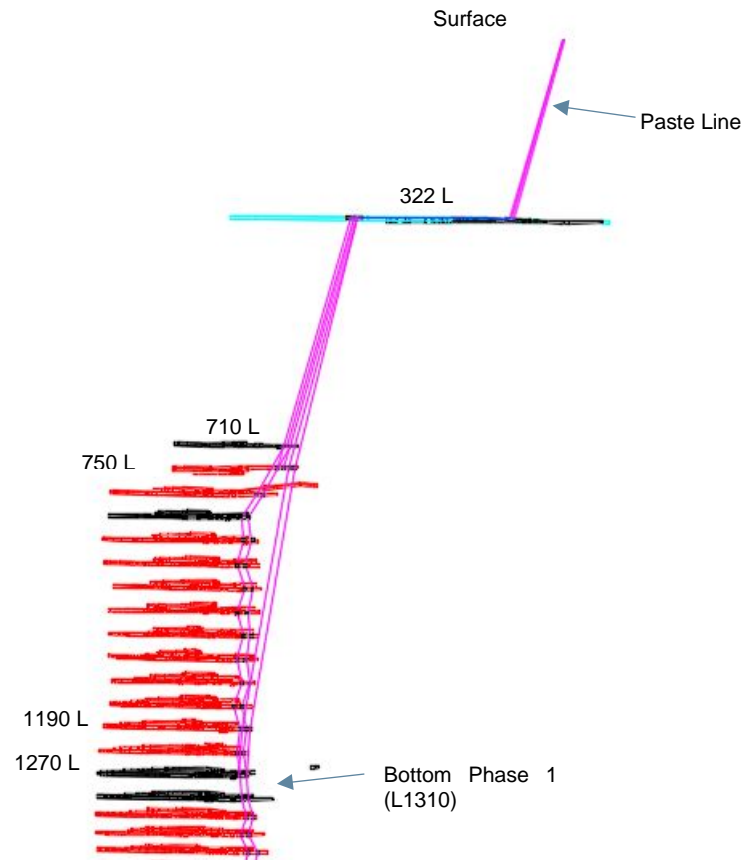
Cemented paste backfill distribution for Horne 5 Mining Complex
